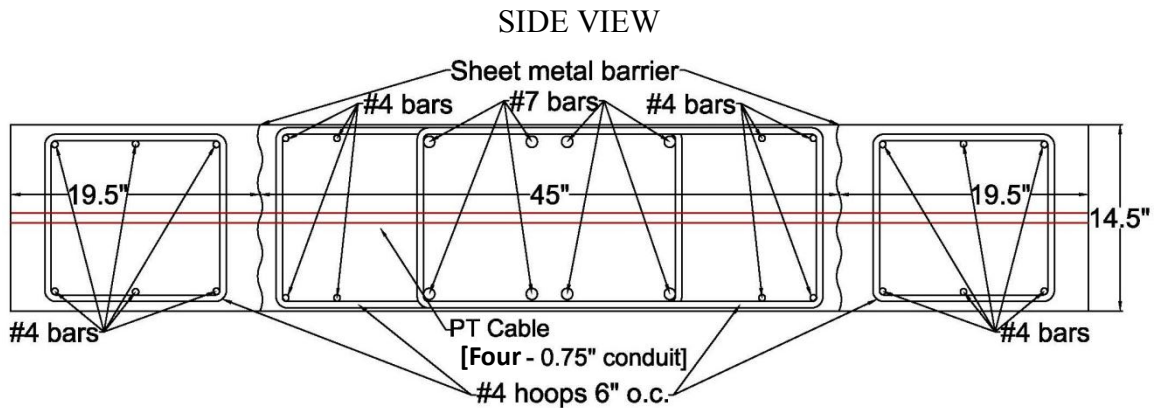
Schematic of Reinforcement Layout (Side View)
